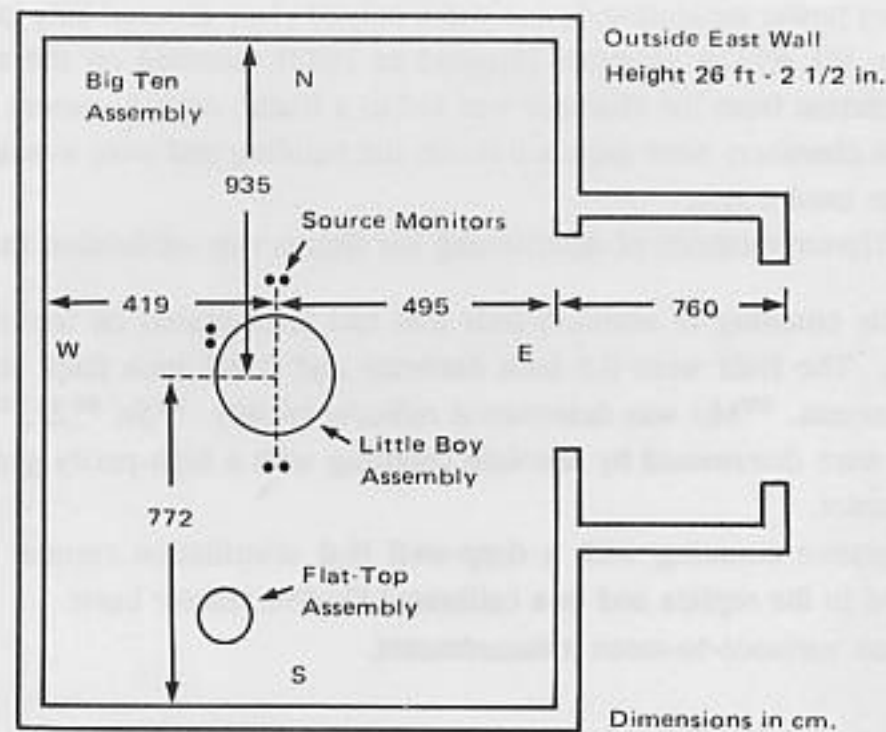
Floor plan of the building (kiva) in which the Little Boy reactor was used when not outdoors.
